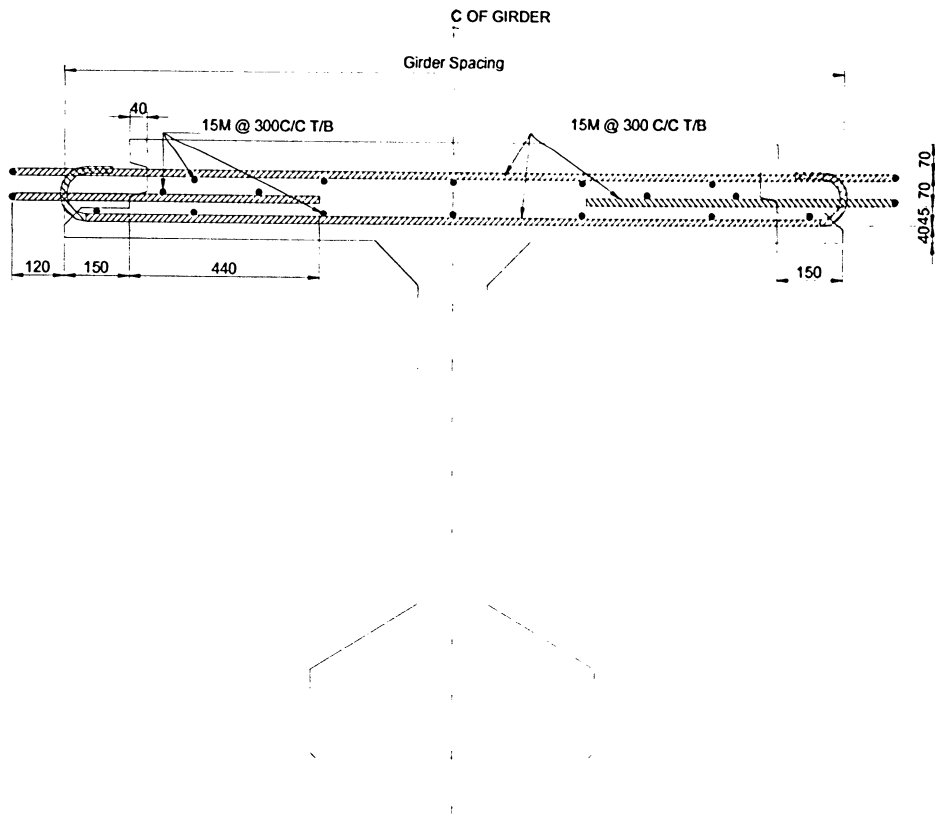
Cross-Section of the MTC-1 girder Connection with Structural Details
